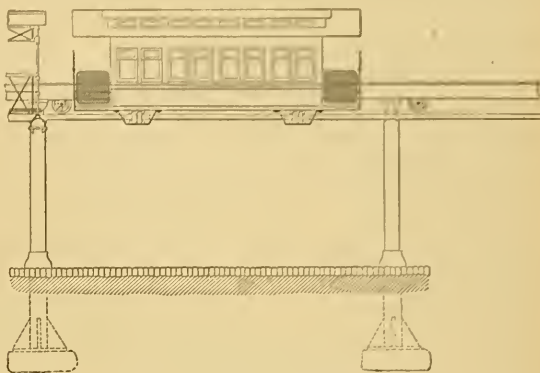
ADAMS' ELEVATED RAILWAY.
